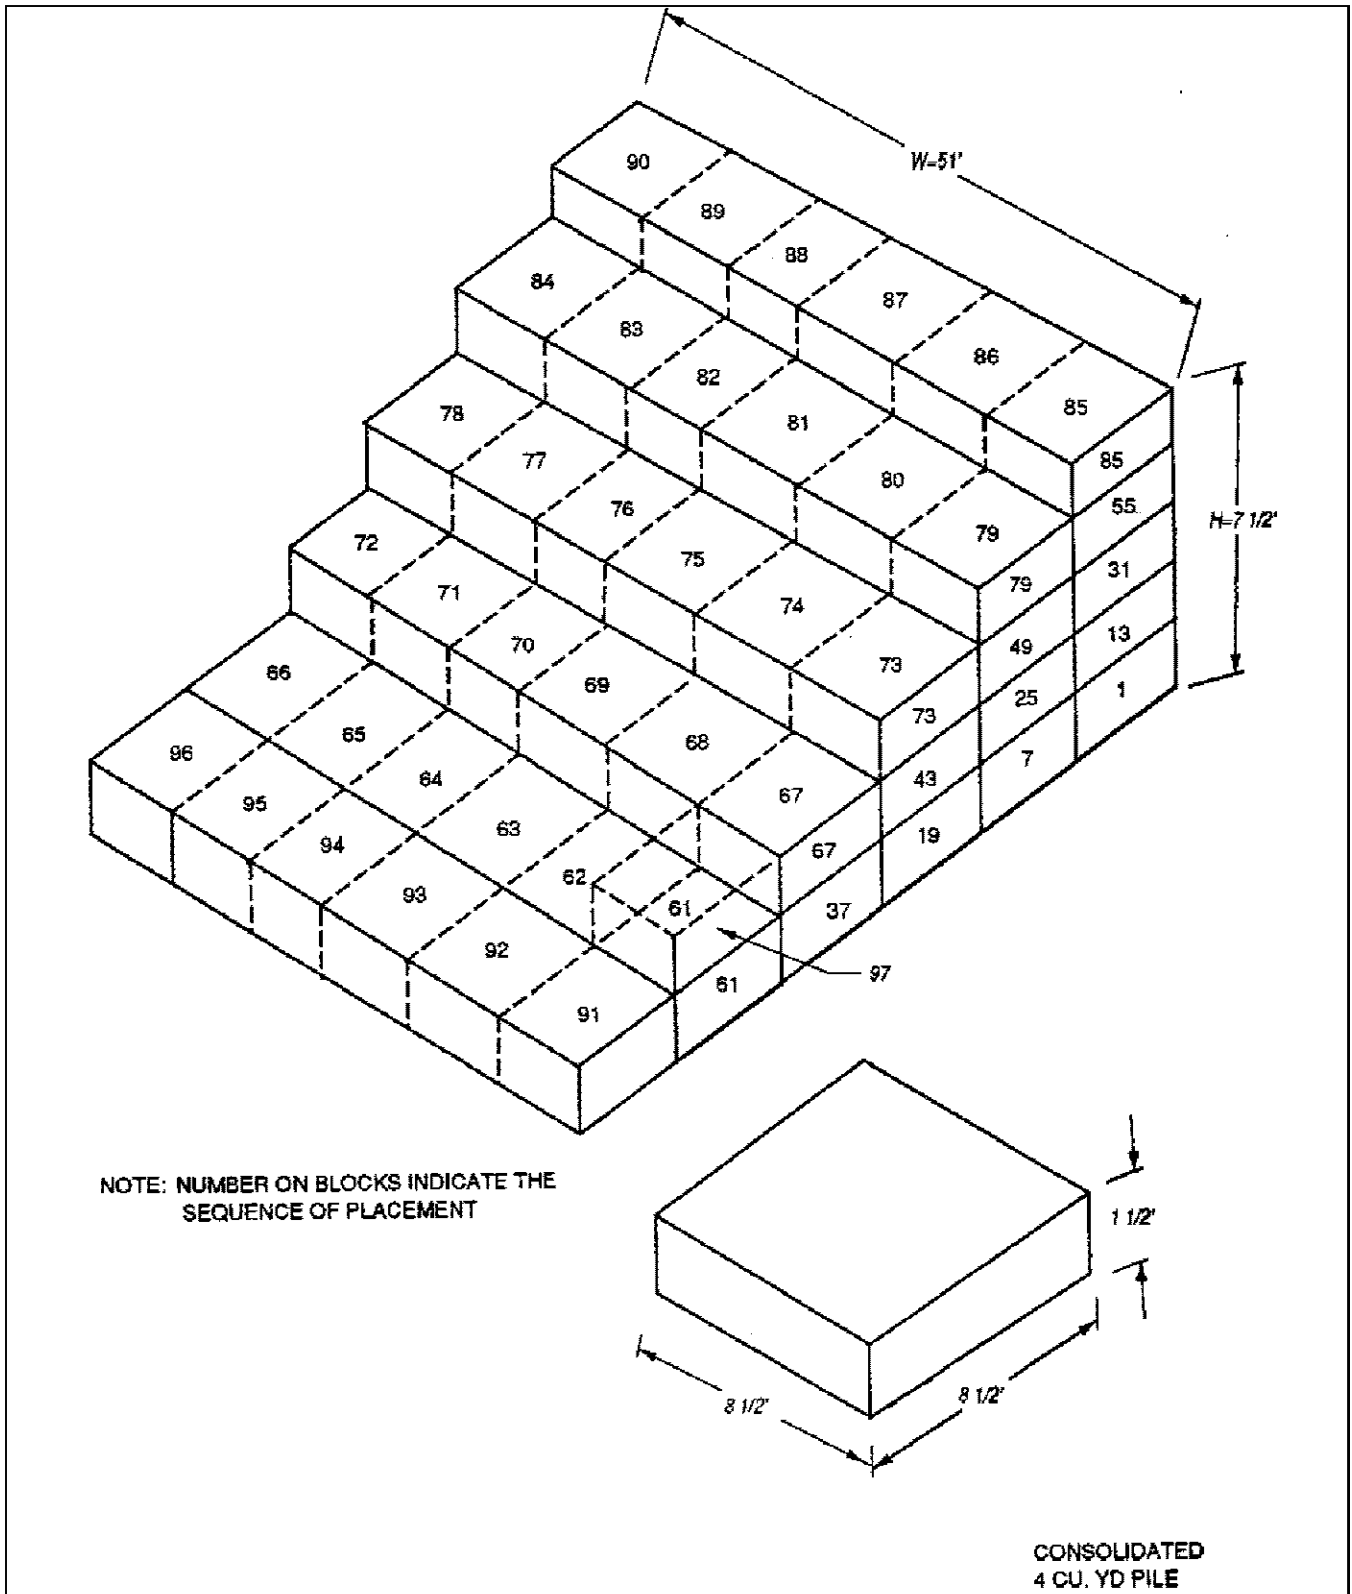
Stepped placement sequence and plant capacity, 7-1/2-ft lift height
